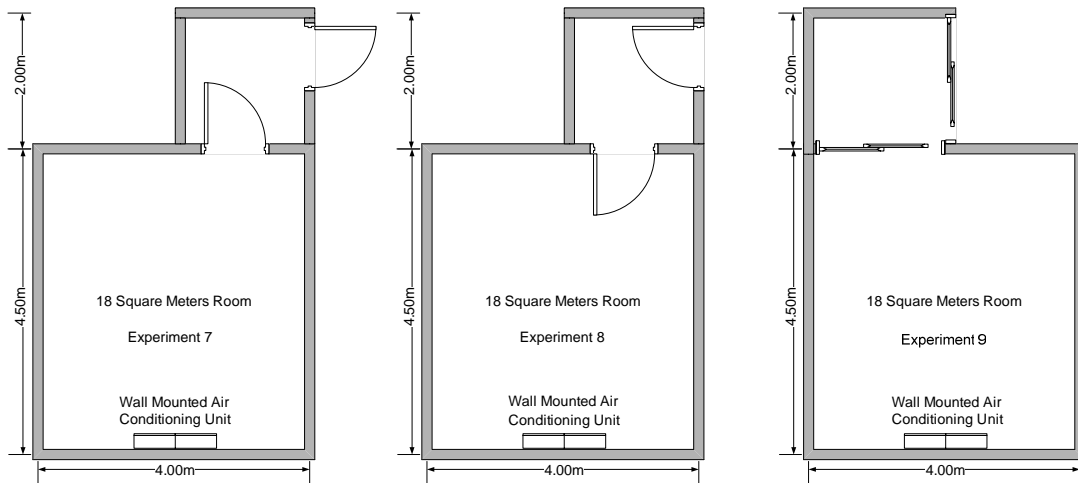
Floor Plan of Experiments 7 – 9: A Double Perpendicular Door
